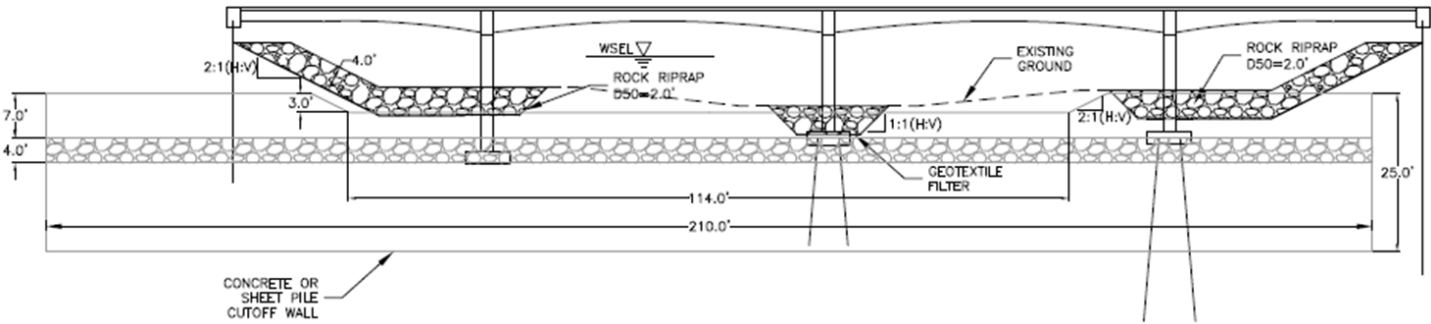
Cross-sectional view of Bridge G-17-M with recommended hydraulic scour countermeasures
